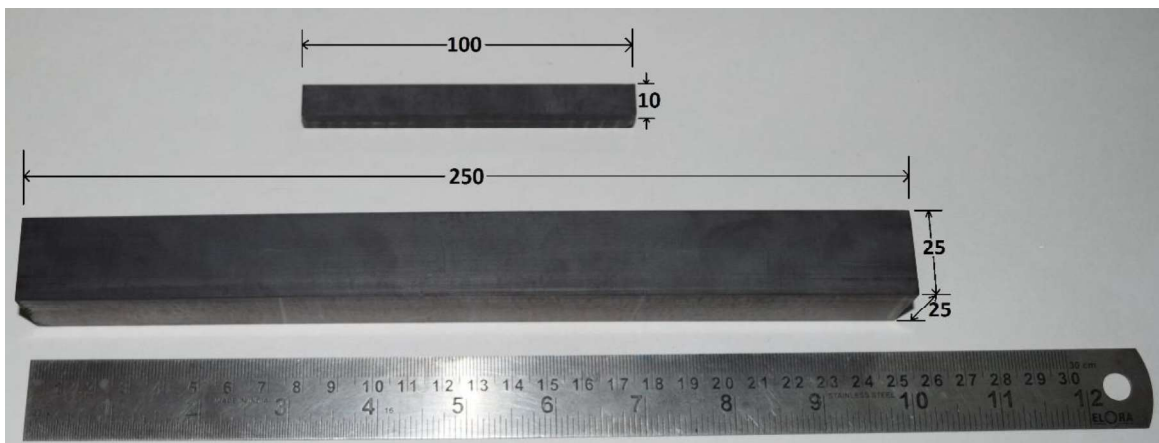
Small and large size flexural specimens having square cross-section.
